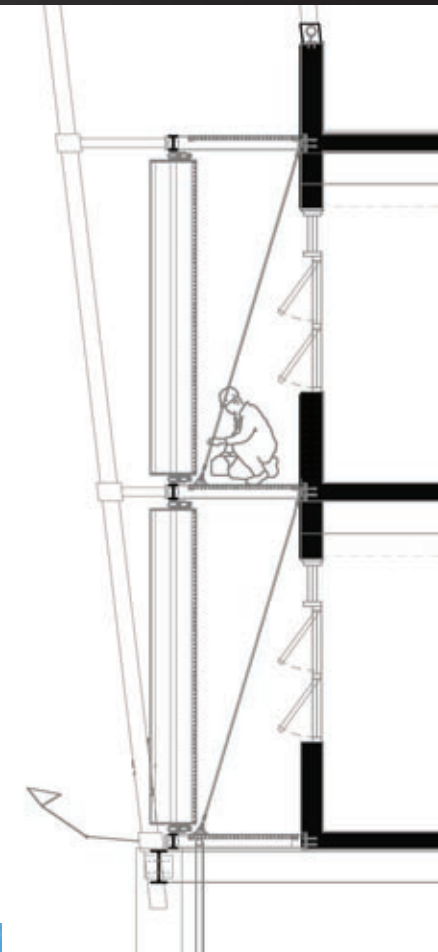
Enlargement of the East facade showing vertical louvres connected to a steel frame as a second skin
